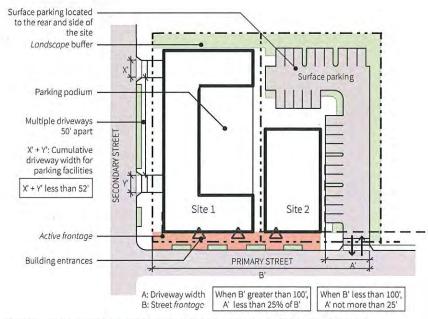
Driveways leading to parking garage and another driveway with associated surface parking.
